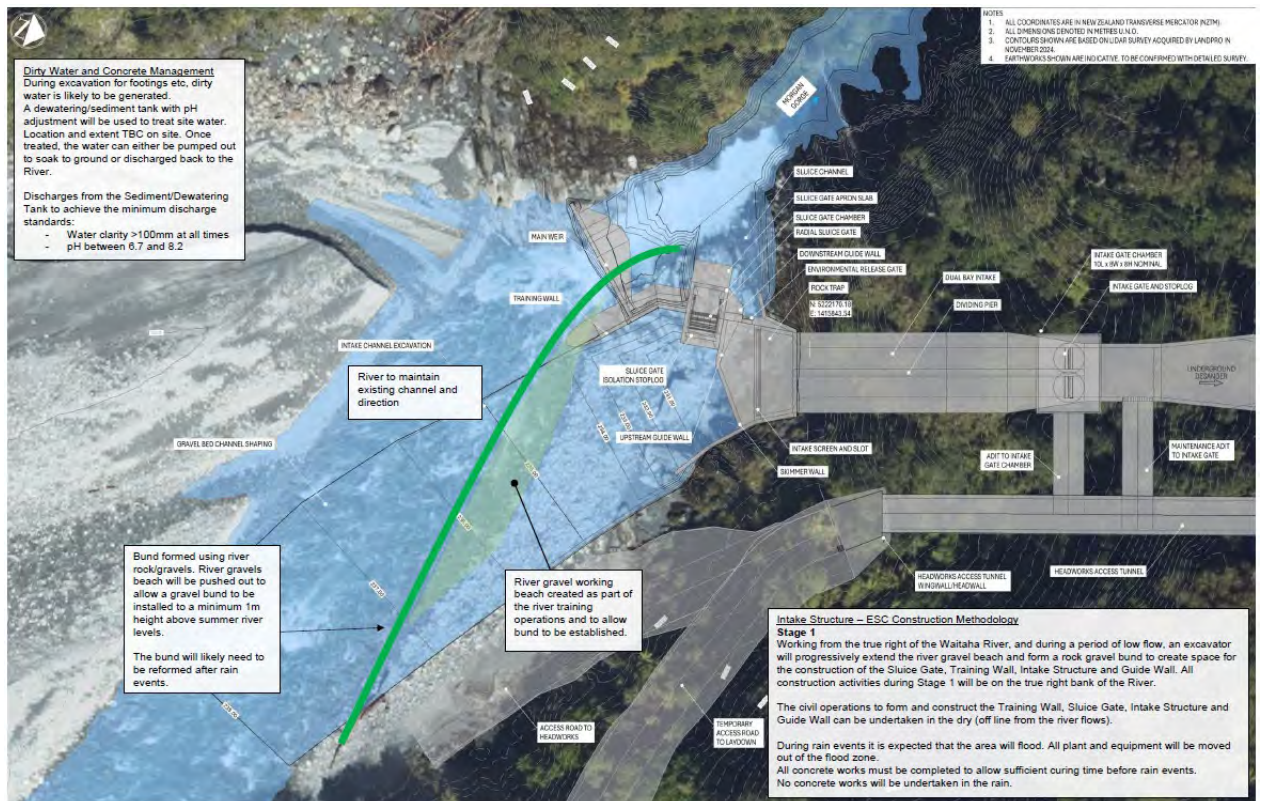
DRAFT Stream Works Plan – Construction of true-right Headworks structures
